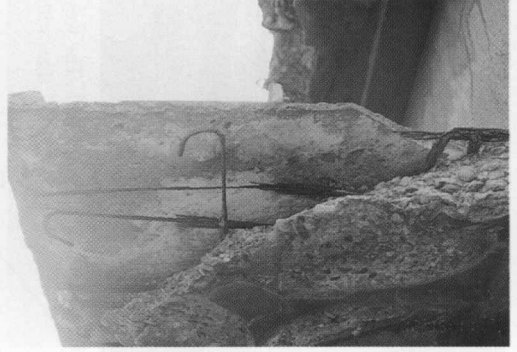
Exposed steel due to scaling and spalling concrete of lean-to roof of vestibule
